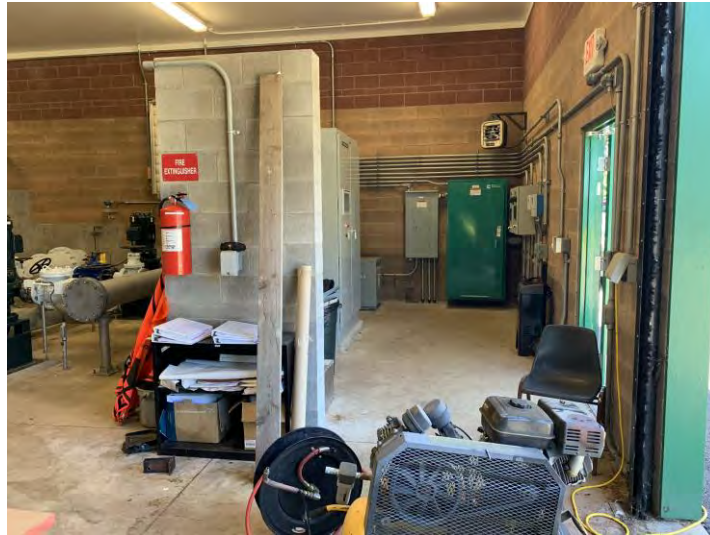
Unbraced Partial Height CMU Walls in Electrical Room
